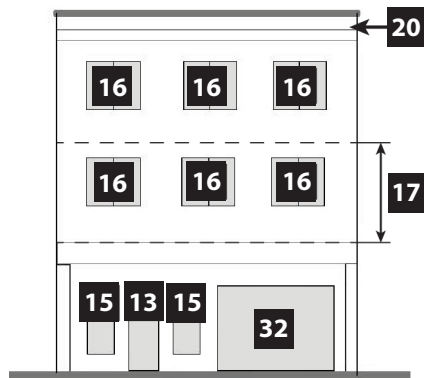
Limited bay building street facade diagram shown with vehicle bay, storefront entry type, and parapet roof type. Not to scale.
